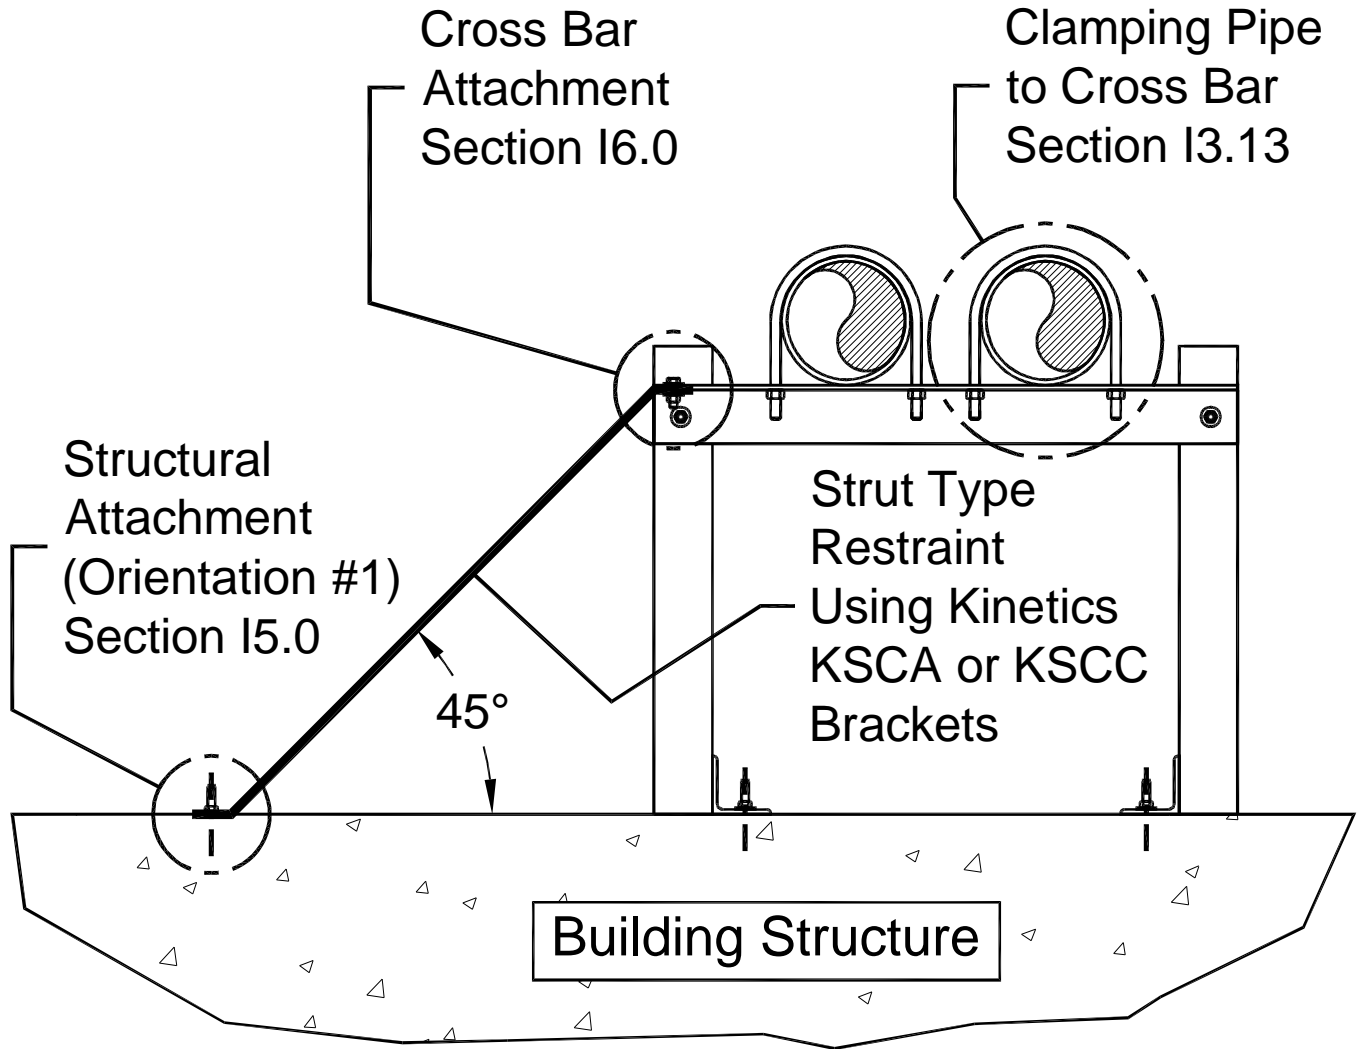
; Transverse (T) Strut Type Restraint Schematic for Floor/Roof Mounted Pipe – Side Strut at a 45° Angle
